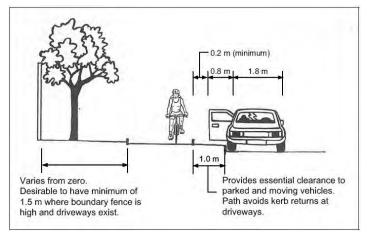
Location of path in road reserve (Austroads, 2009)
